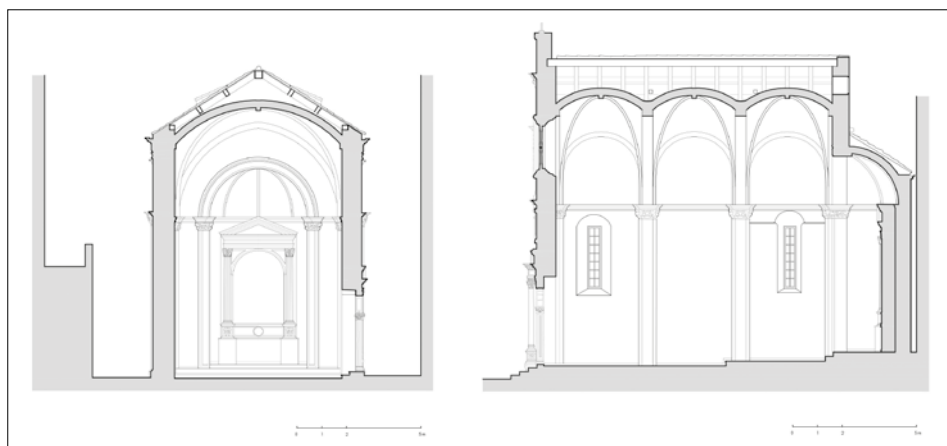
Cross section with view towards the sanctuary and longitudinal cross section.
